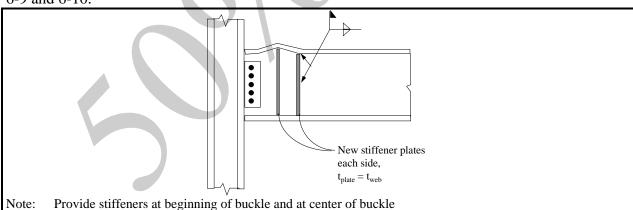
Addition of Stiffeners at Buckled Girder Flange
